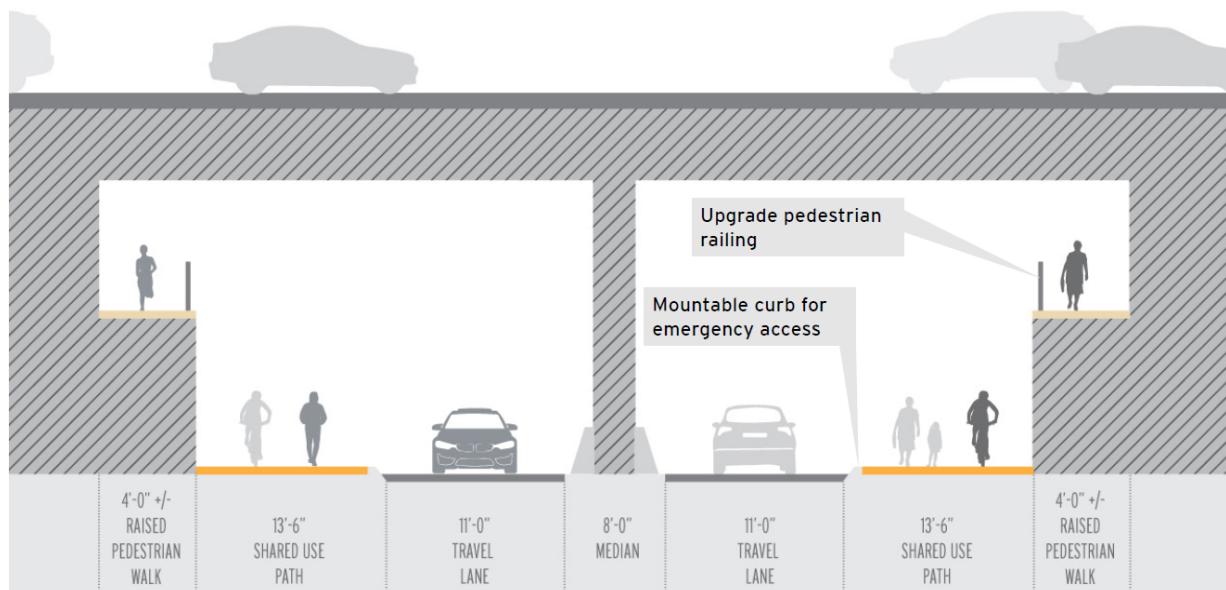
Greenwood Avenue Concept 1: Cross Section C
